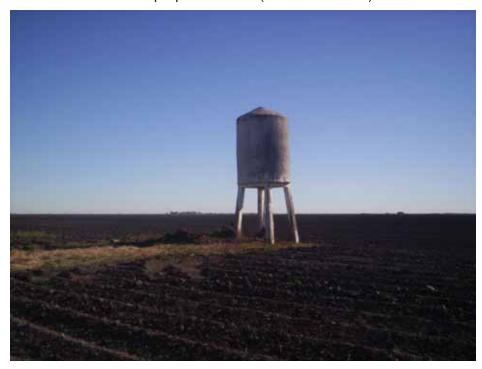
Water storage tank (Map ID 12 – Figure A.4.13-4) within proposed ROW (December 2008).
